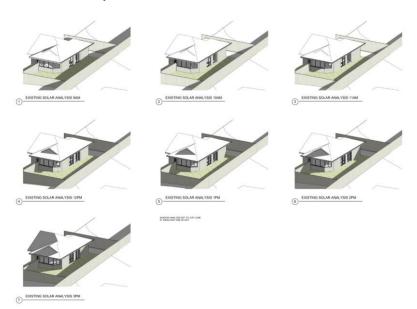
Existing Shadow Diagrams to 30A Oakleigh Avenue (Source: Place Studio)
